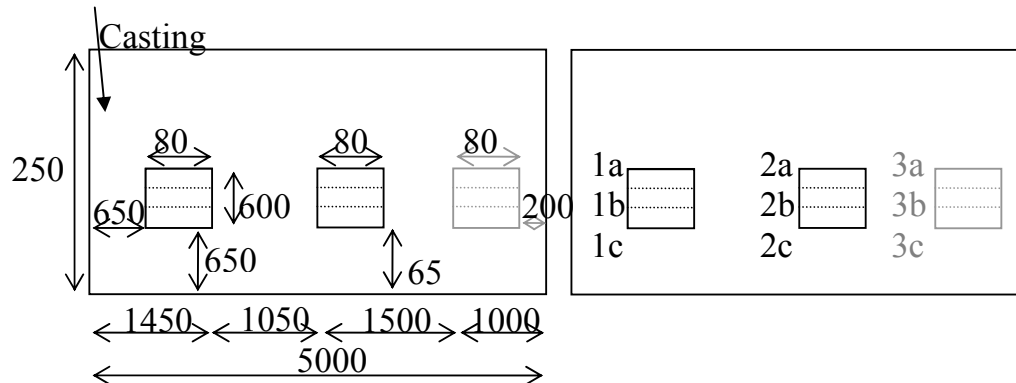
Dimensions and numbering of beams sawn from walls. Beam 3a-c were sawn from Wall 3 and Wall 4 only.
